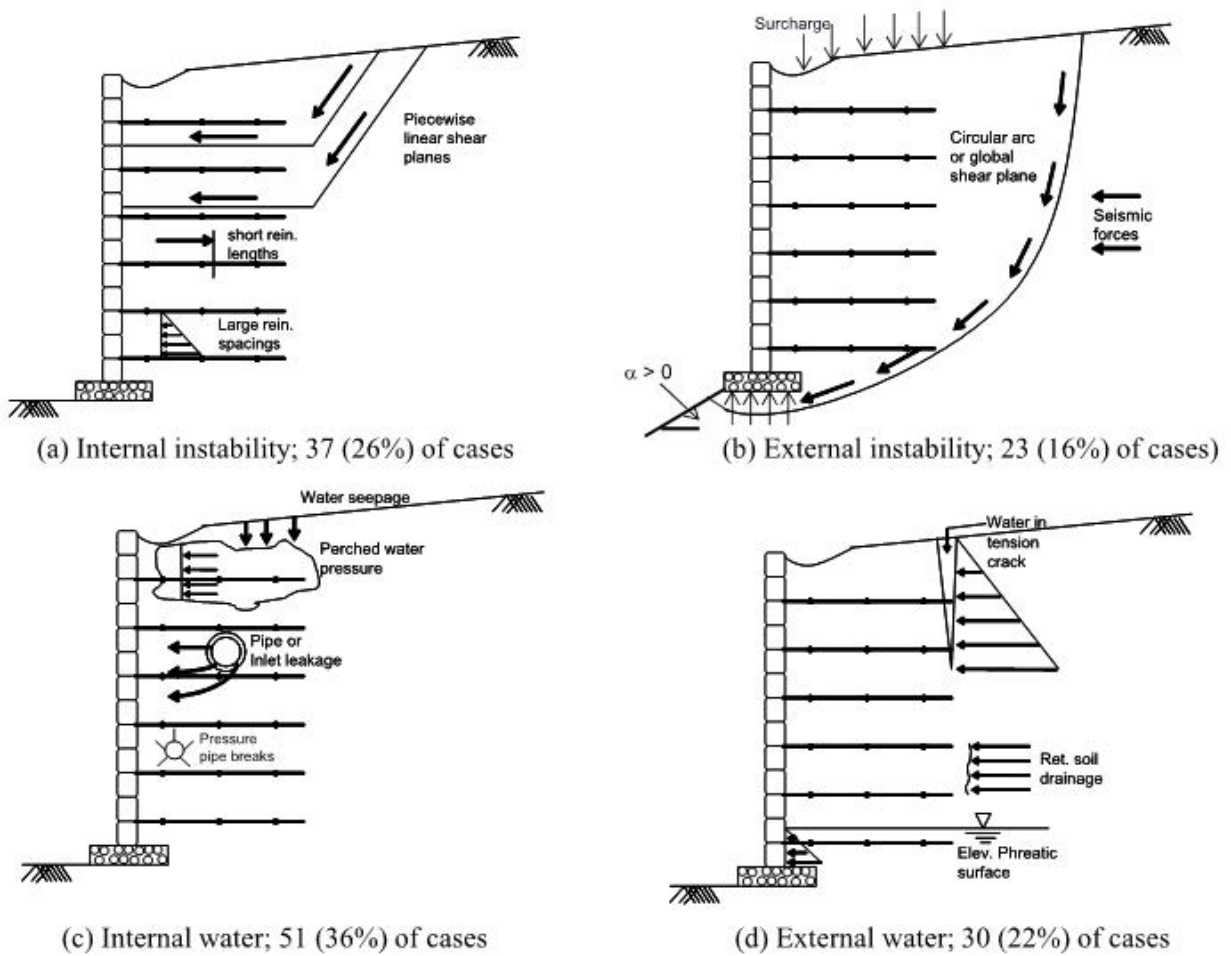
MSE wall failure mechanisms (after Koerner and Koerner 2012).
